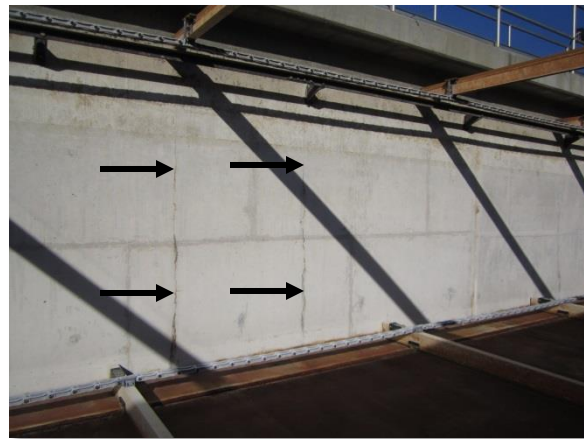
Typical vertical cracks spaced every few feet along length of north wall.
